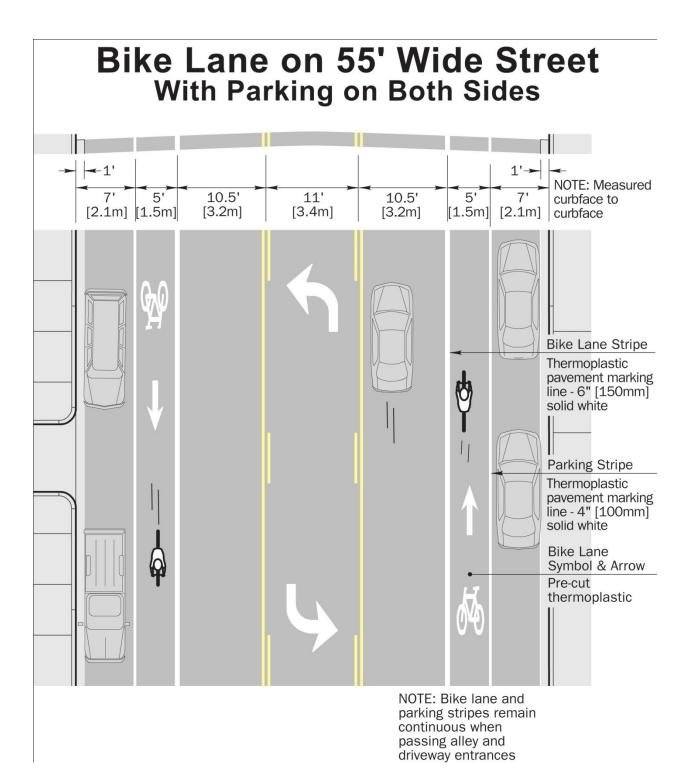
BIKE LANE ON 55' WIDE STREET WITH PARKING
